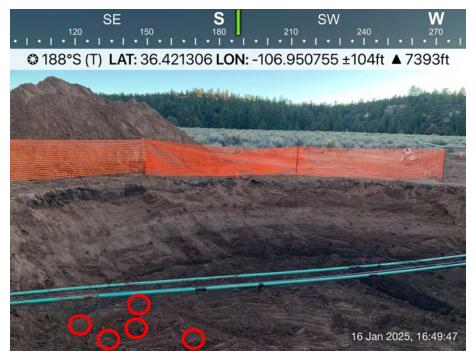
SS16 collected as a five-point composite sample from southeast base of excavation.
